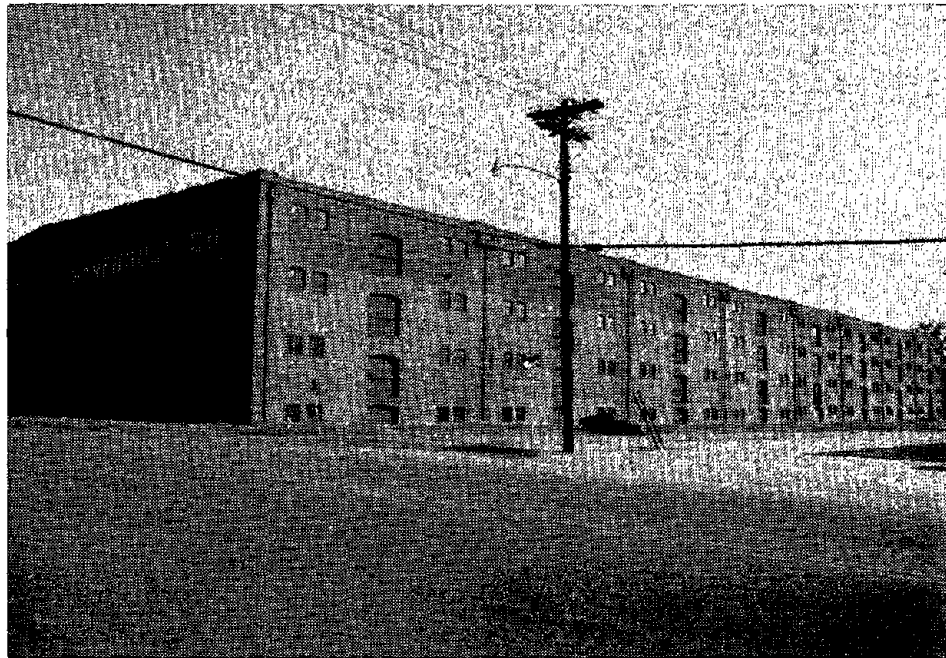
URM INDUSTRIAL BUILDINGS
